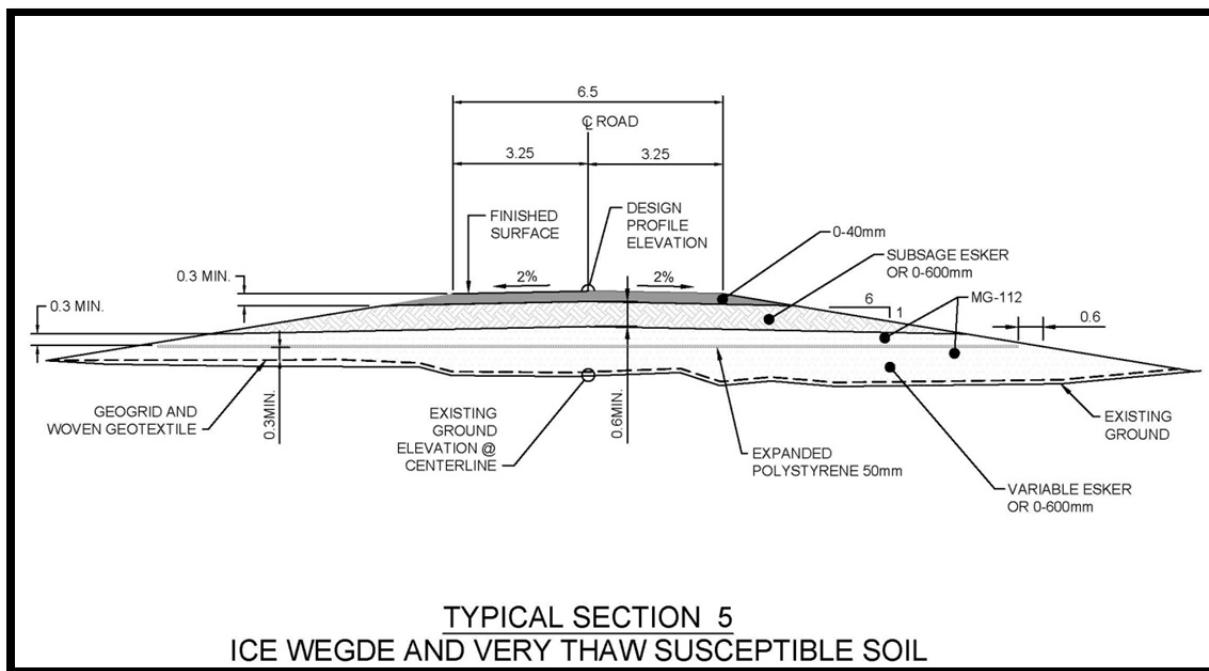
Typical Road Cross Section for Thaw Susceptible Soil
